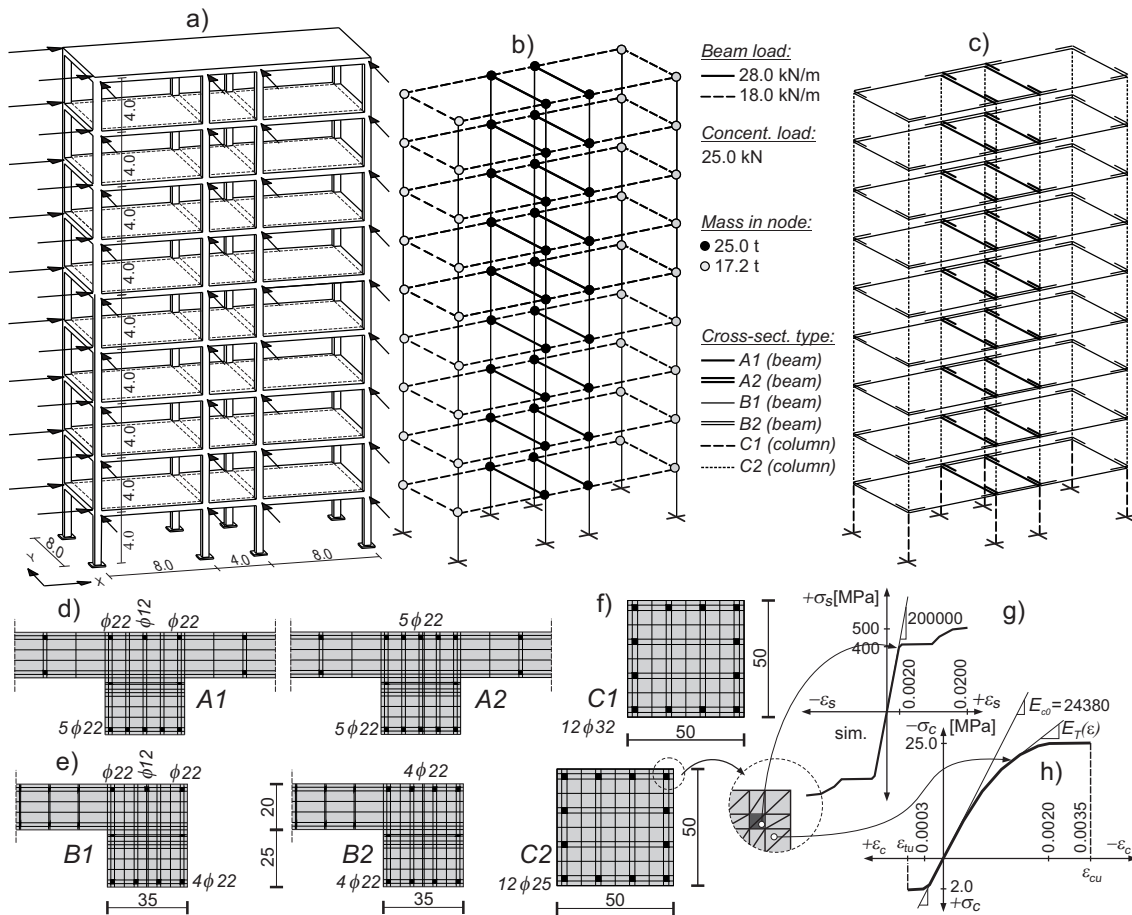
Example: a) Space frame; b) loading on beams and concentrated masses; c) labels of cross sections; d)-f) discretization of cross sections; g)-h) numerical model for steel and concrete.
